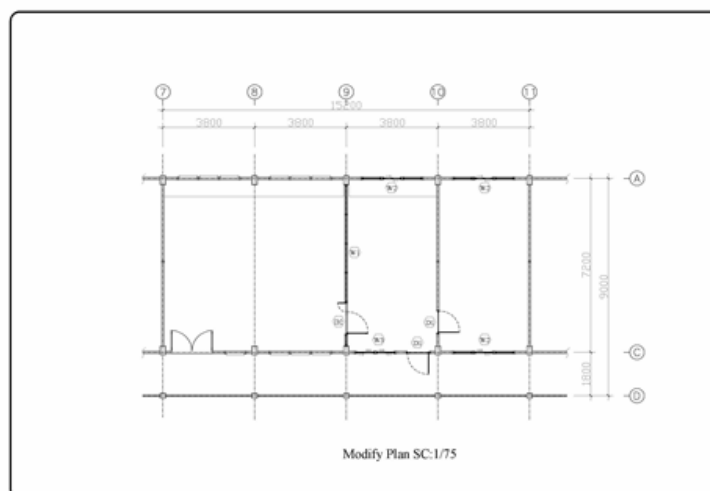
Plans for proposed redevelopment of laboratory space at Souphanouvong University to convert existing laboratory space into a tissue culture facility (preparation room, transfer room and growth room). Note: some of this work has now been completed with funding from this grant, and remaining work will be completed as part of FST/2012/041.
